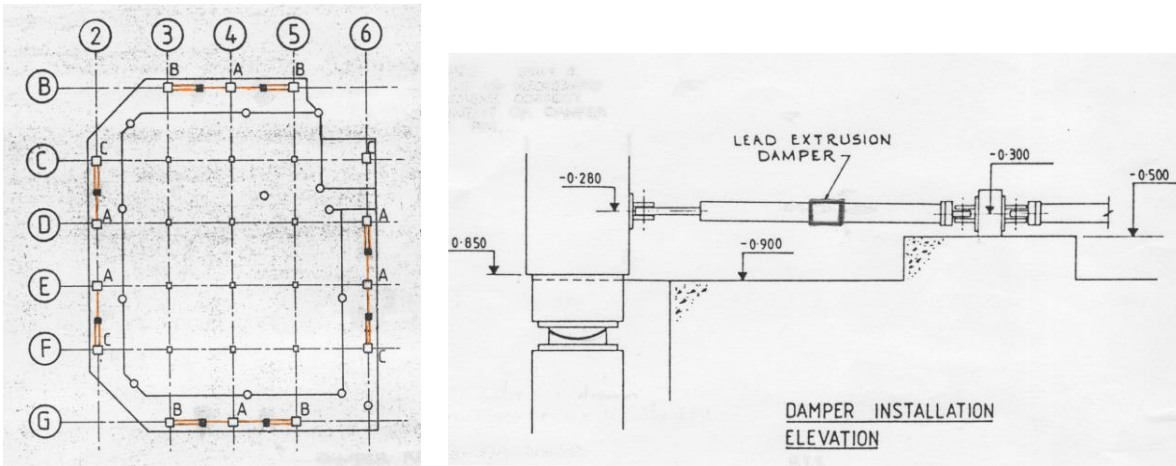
Left - plan positions of lead extrusion dampers; right - arrangement in elevation. Details from MOWD drawing 5/1132/1 7002 205/3.
